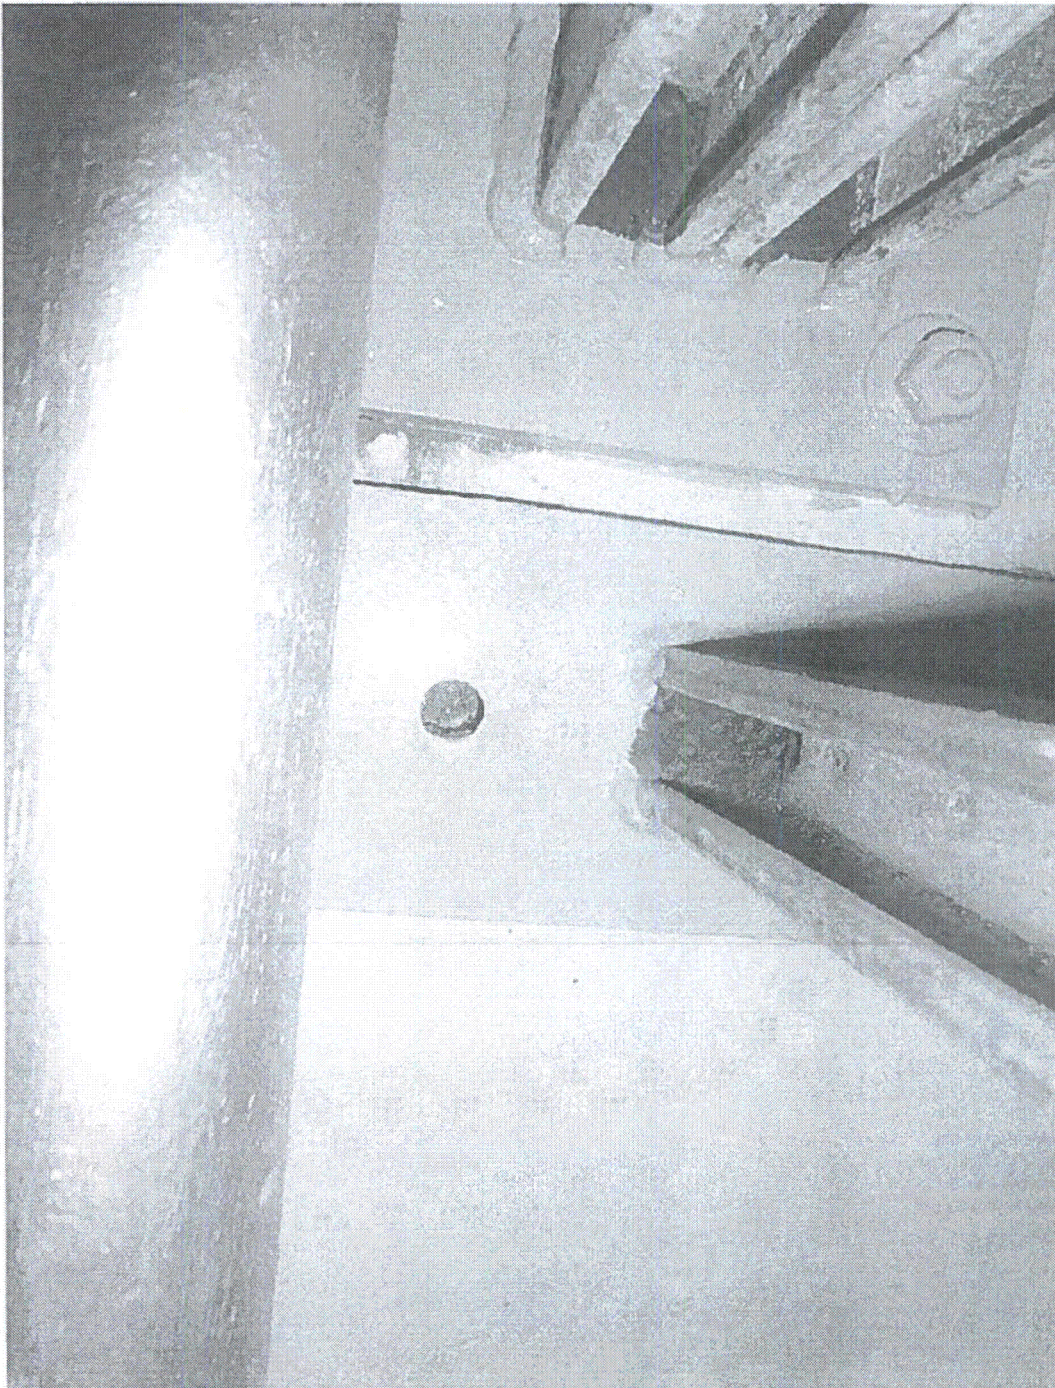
Missing Knee Brace Anchor Bolt (Unit 2 HPCI Room)
